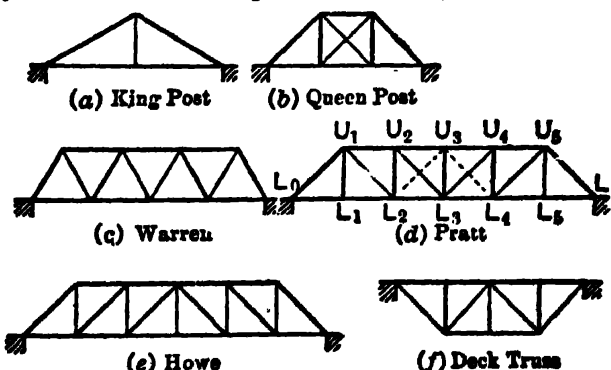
Typical Bridge Trusses (a, b, c, d, e are Through Trusses)
